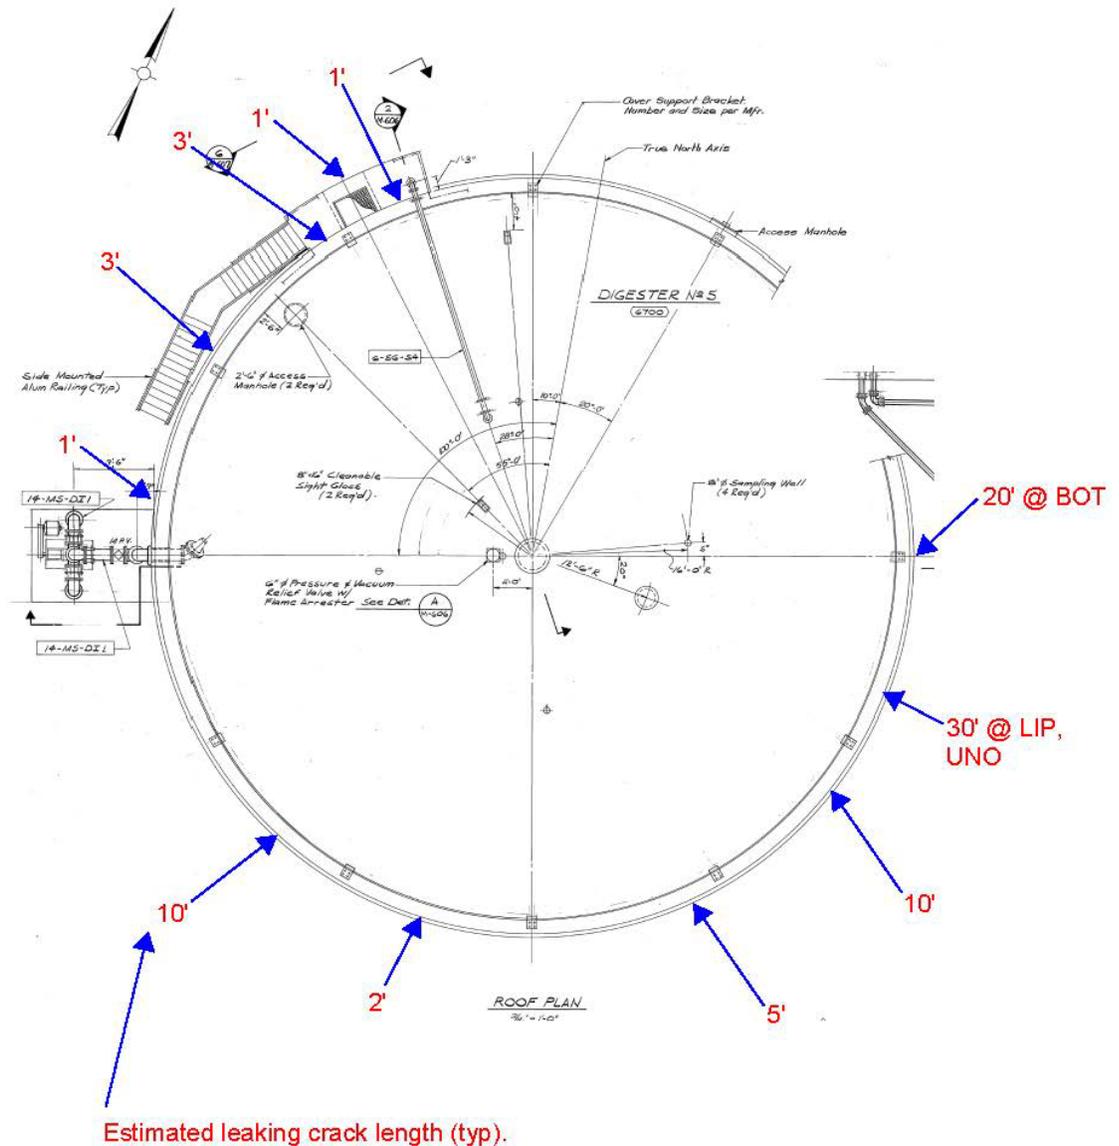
Concrete Wall Leakage (All Minor Weeping)
